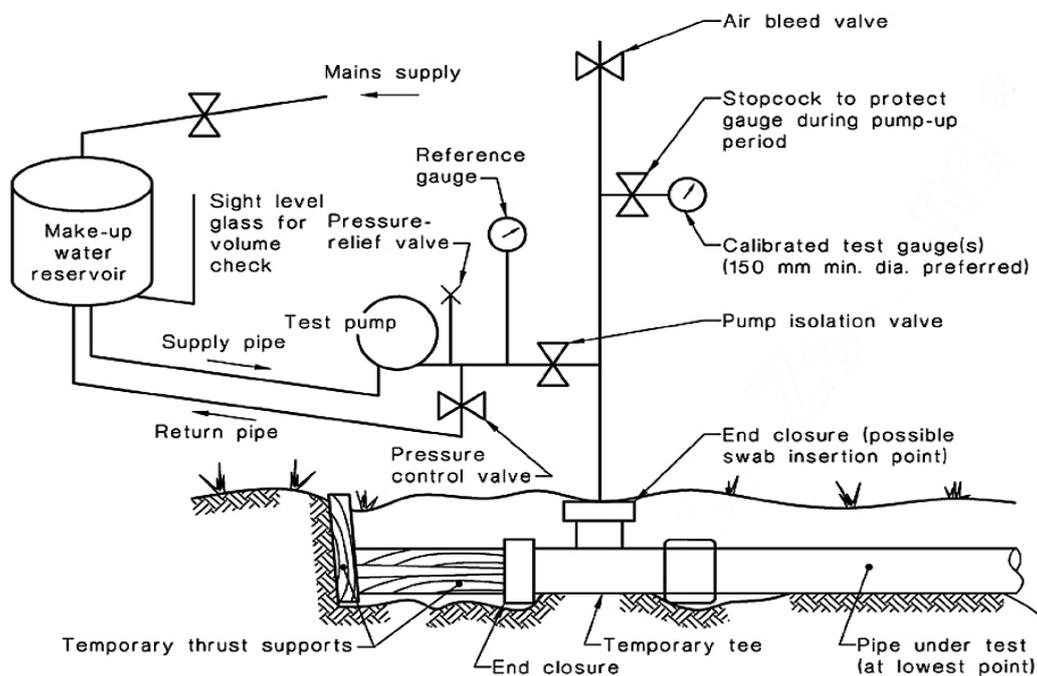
Typical field pressure test equipment layout (designed as appropriate to the test pressure)
